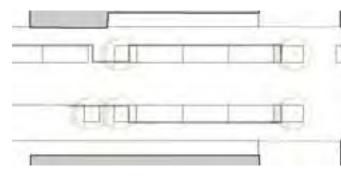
Typical Plan of Parallel Parking on Tertiary Street
